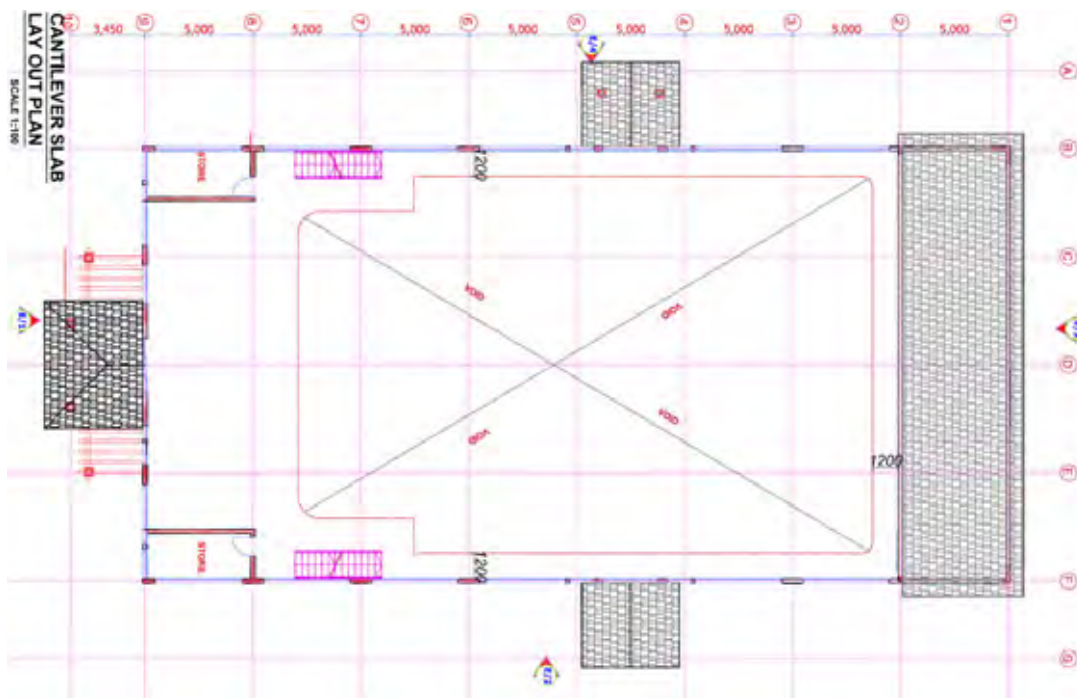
Mezzanine Floor Plan of the Multi-purpose Hall
